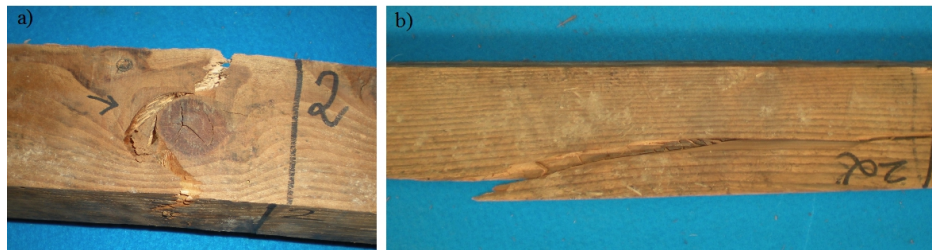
Samples after the bending test. a) Failure around a knot. b) Failure caused by fibre inclination.
